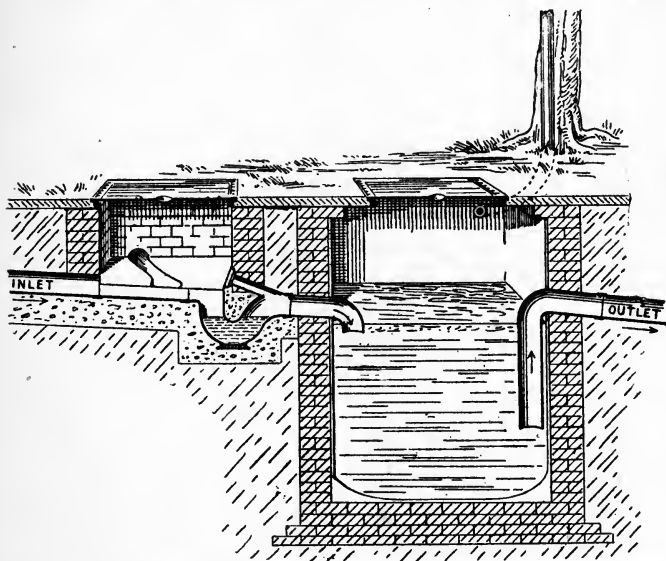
To show construction of cesspool. Note intercepting trap between the drain and cesspool.
